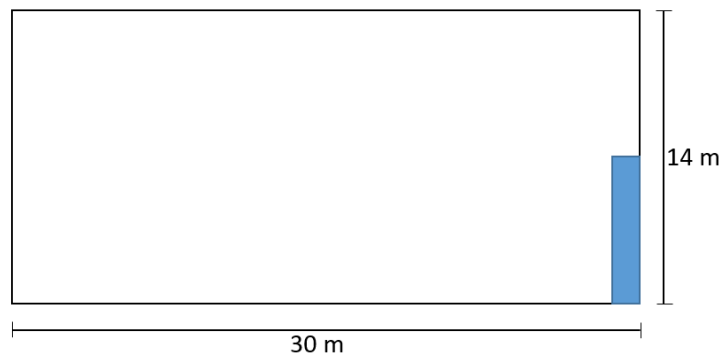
floor plan with slab element (Option 1 or 3), self-generated figure
